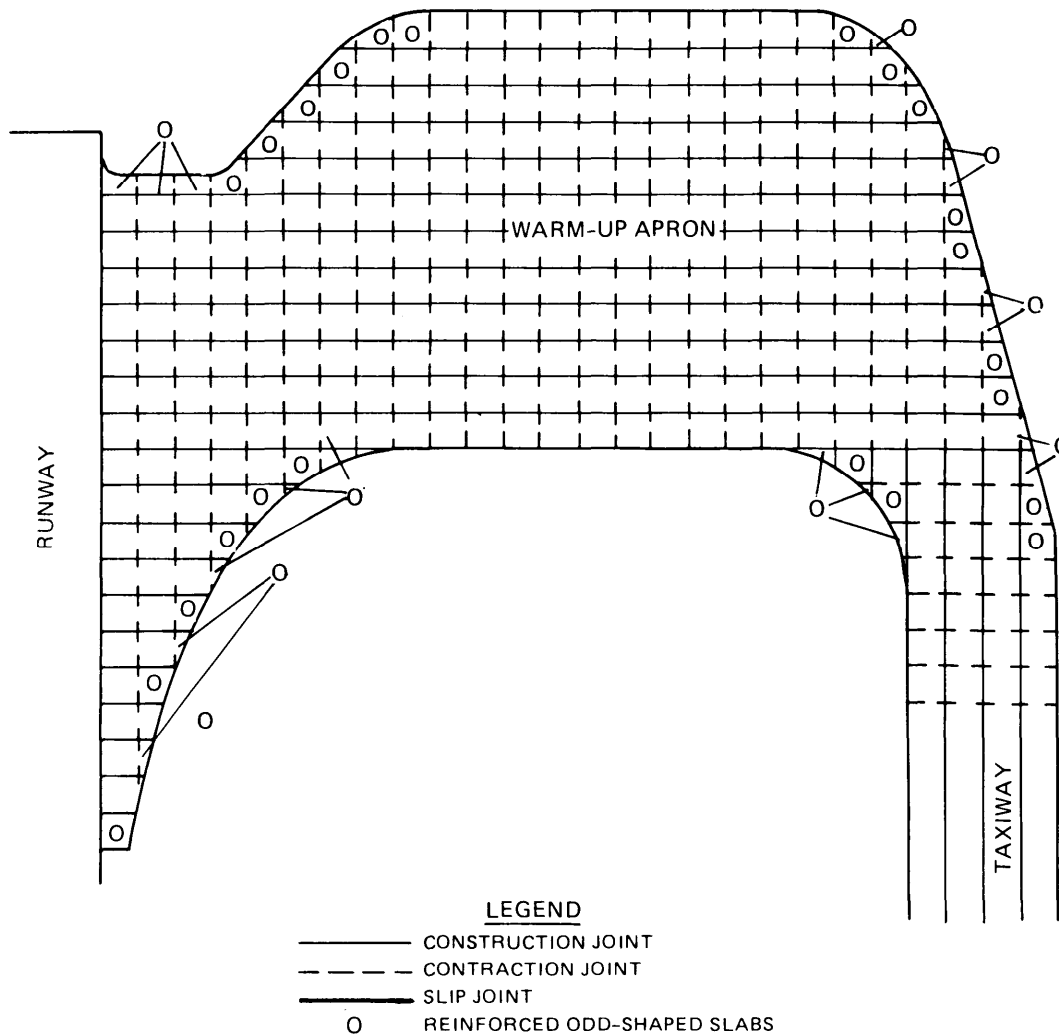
Typical layouts showing reinforcement of odd-shaped slabs and mismatched joints. (Sheet 1 of 2)
